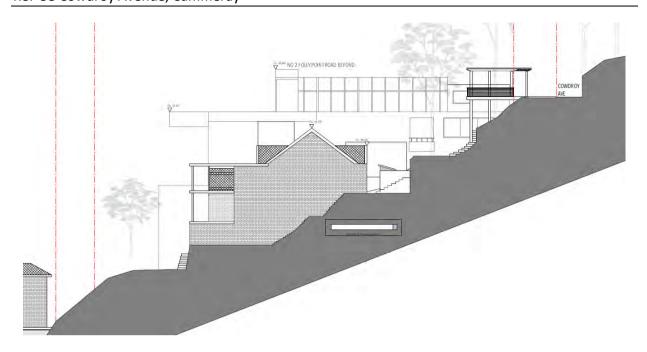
Existing west elevation showing significant alterations to the natural topography and slope of the site and the boards sewer.
